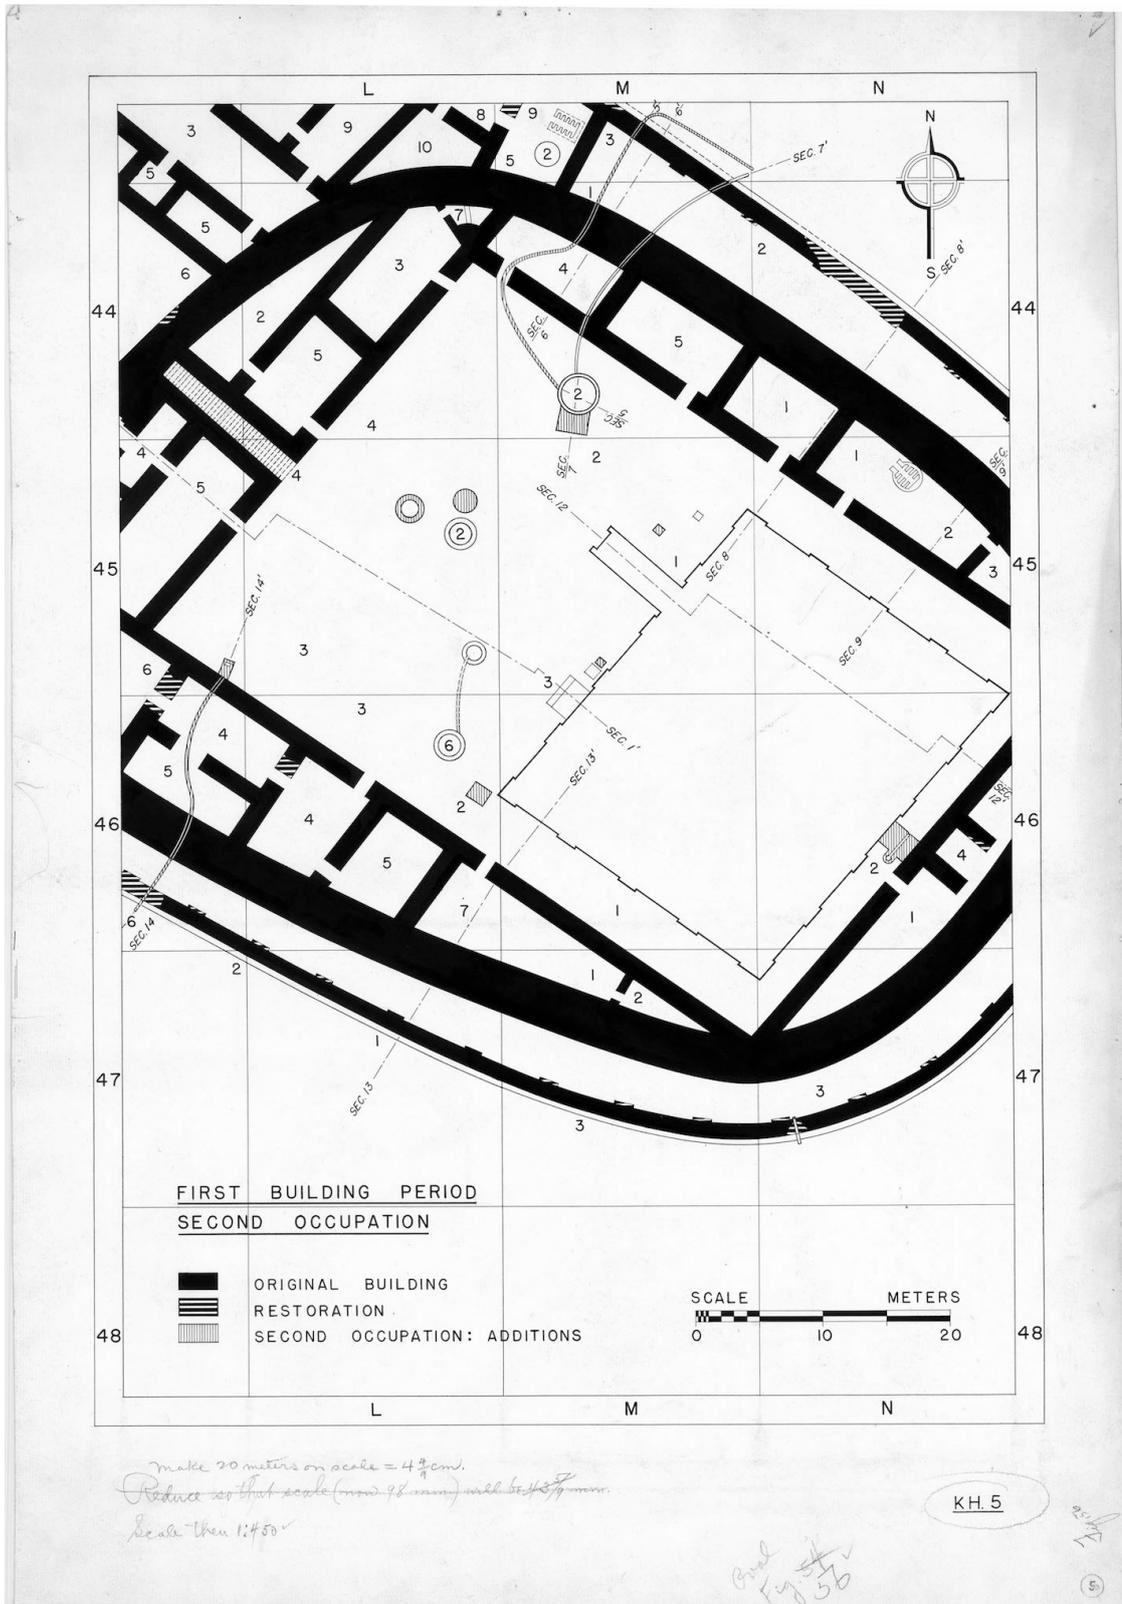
PLAN OF THE TEMPLE OVAL, FIRST BUILDING PERIOD, SECOND OCCUPATION
